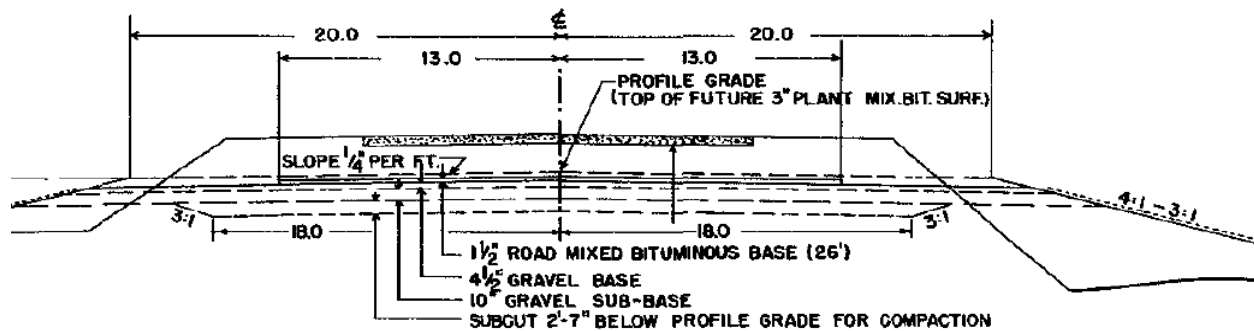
TH 18 mainline typical section (1955 construction plan)
